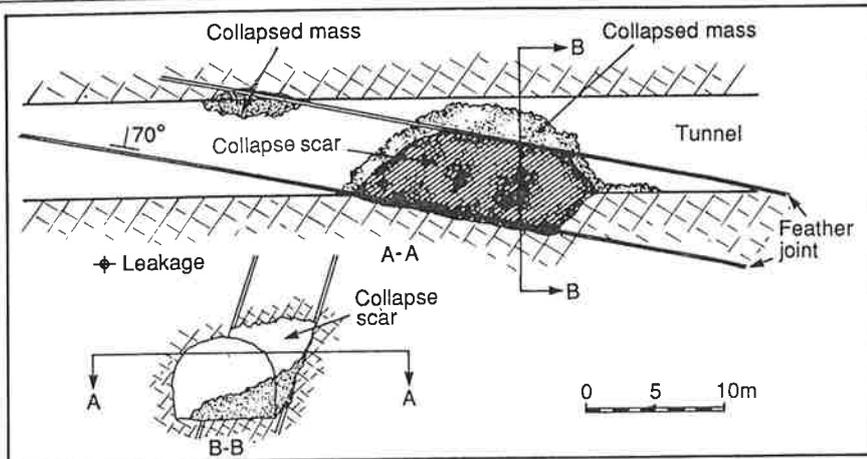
Geological conditions in the tailrace tunnel at Tunnsjoedal Hydropower Plant (1962). Fast installation of the concrete lining prevented a larger slide which could have resulted in much higher costs for rock support.
